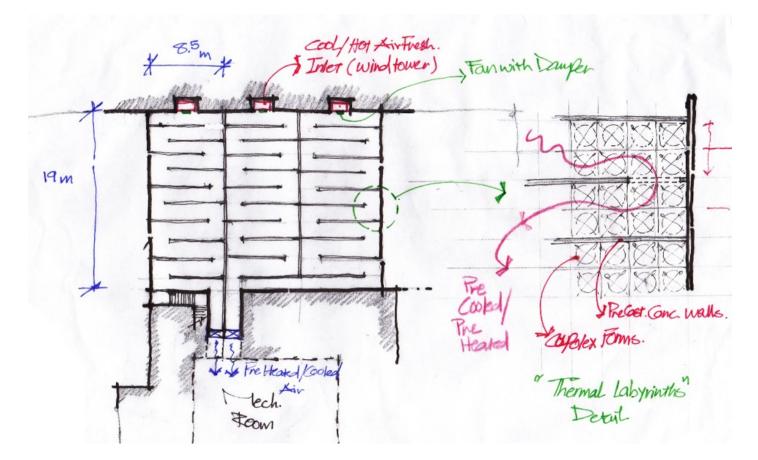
Detailing the Labyrinths using a combination of IGLU form work and modular non bearing concrete walls
